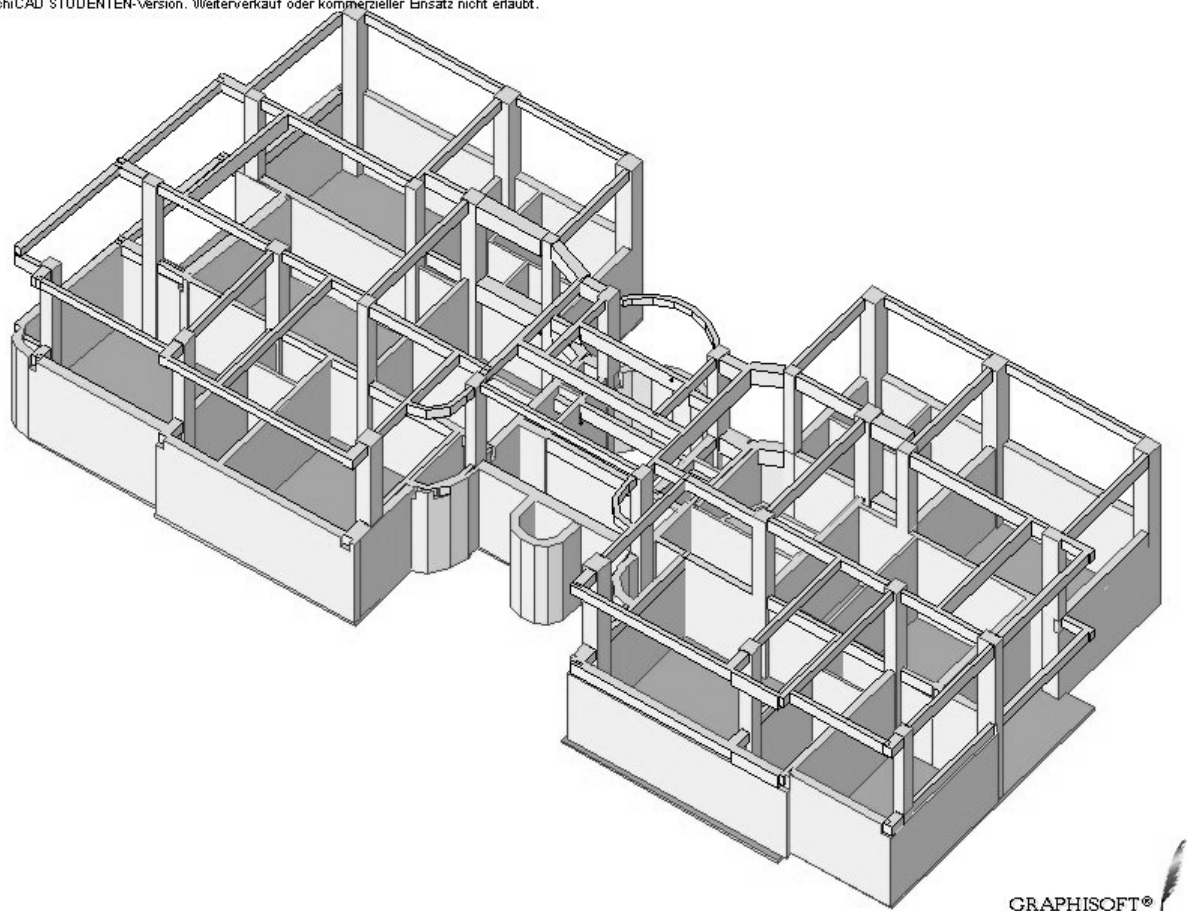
Axonometric view of the relationship between load bearing elements and masonry walls (from Bostenaru, 2004)
